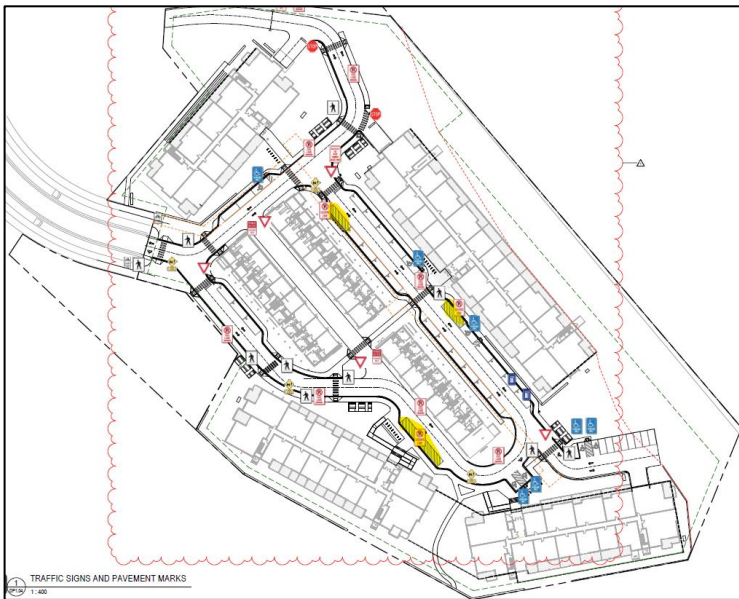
Loading stalls (marked in yellow) in relation to proposed building locations.
